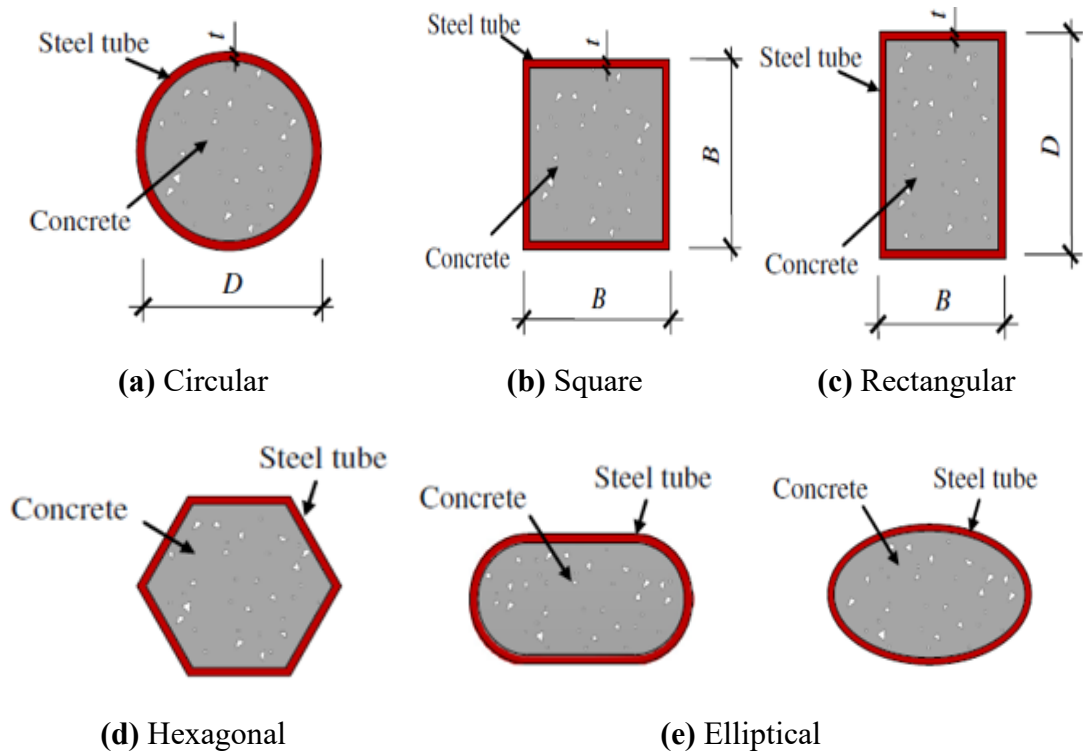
Typical cross-sectional shapes of CFST column (Ren et al., 2014)
